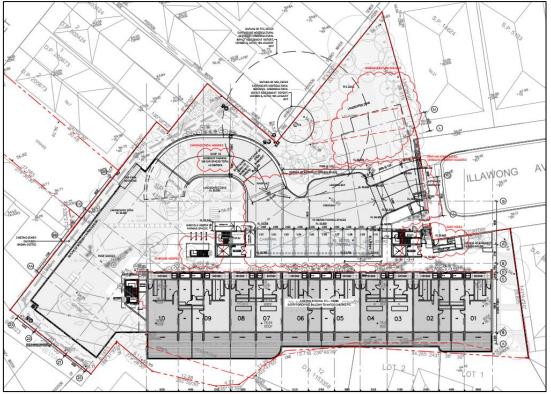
Extract of Proposed Ground Floor Plan – 20 Illawong Avenue, Tamarama Source: Group GSA
